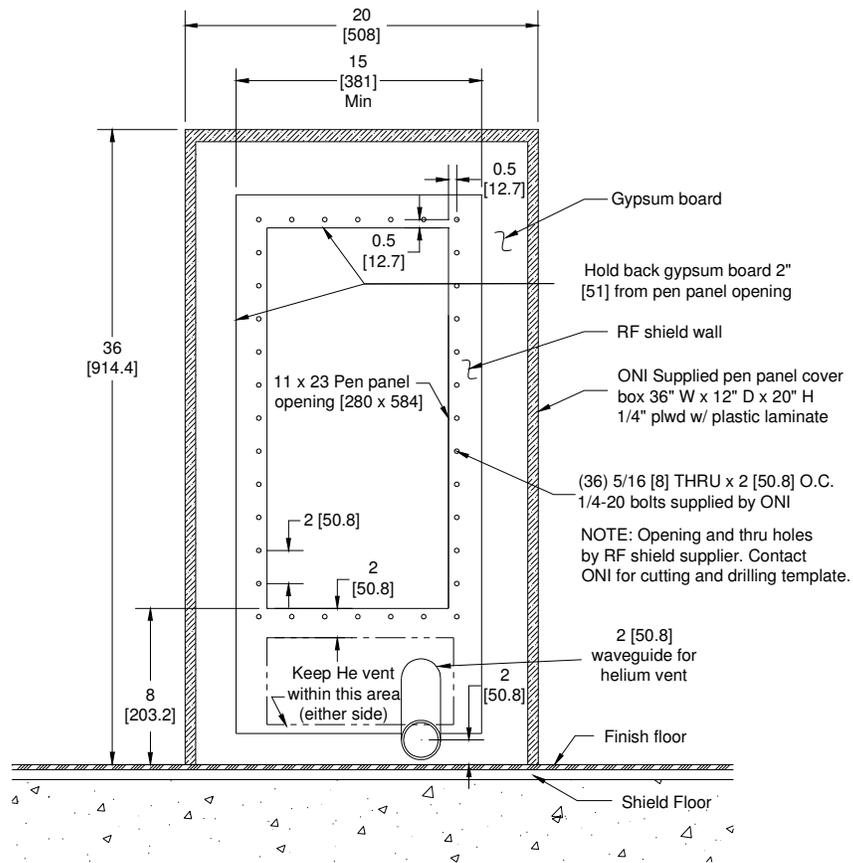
Exam room elevation showing penetration vertical panel opening & helium vent waveguide penetration.
